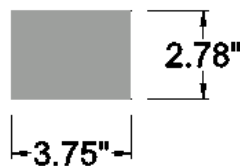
Elevation view (all irregular shape models sections with flat roof)
